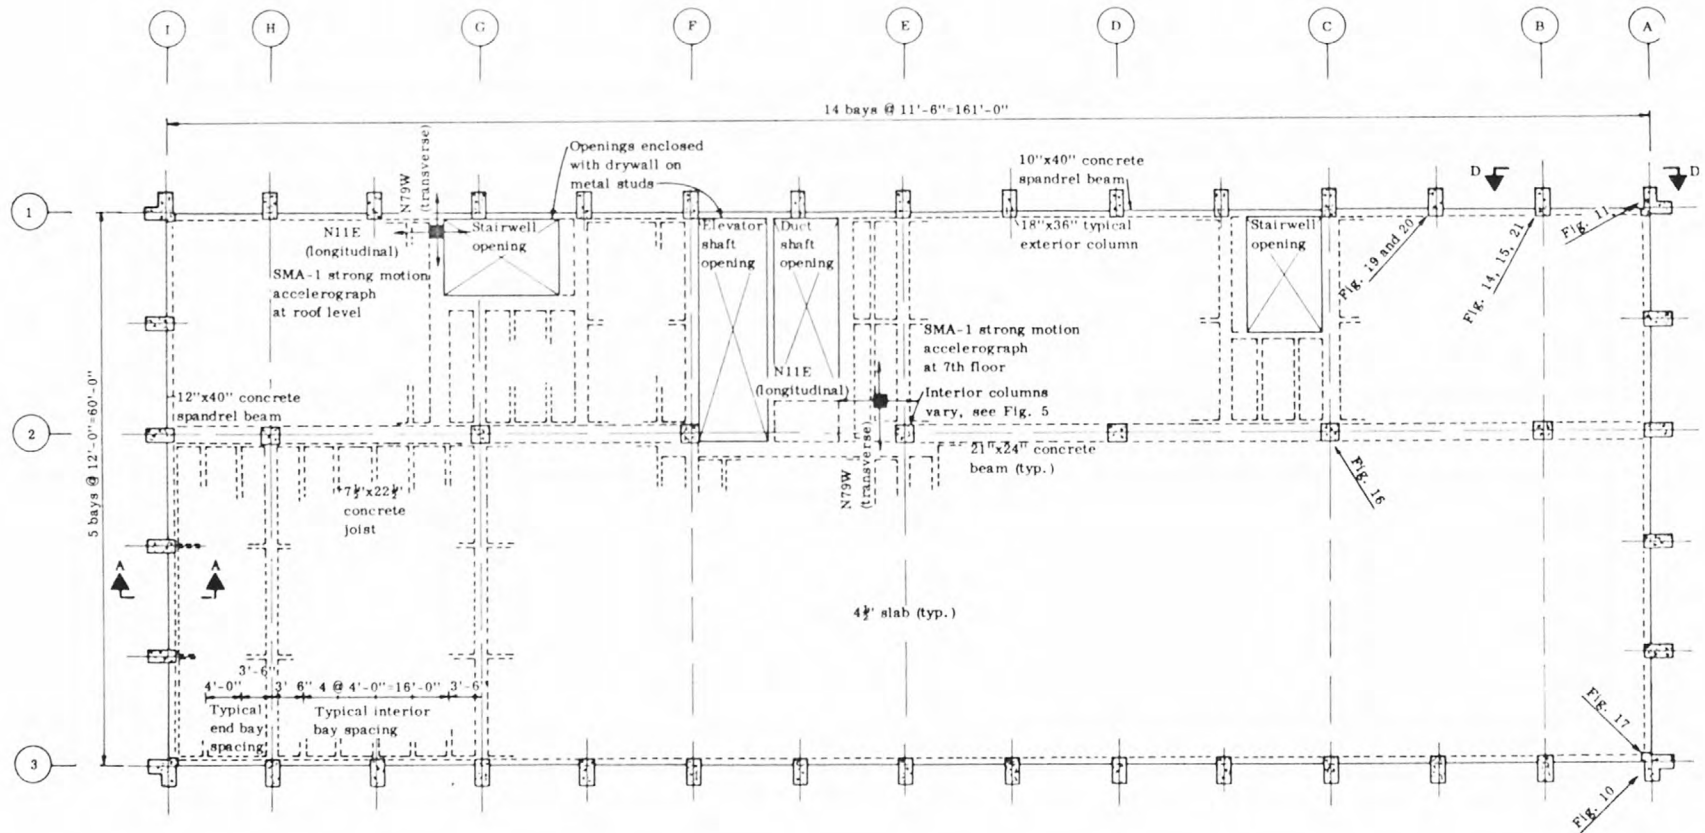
BANK OF CALIFORNIA BUILDING: SECOND-FLOOR PLAN
